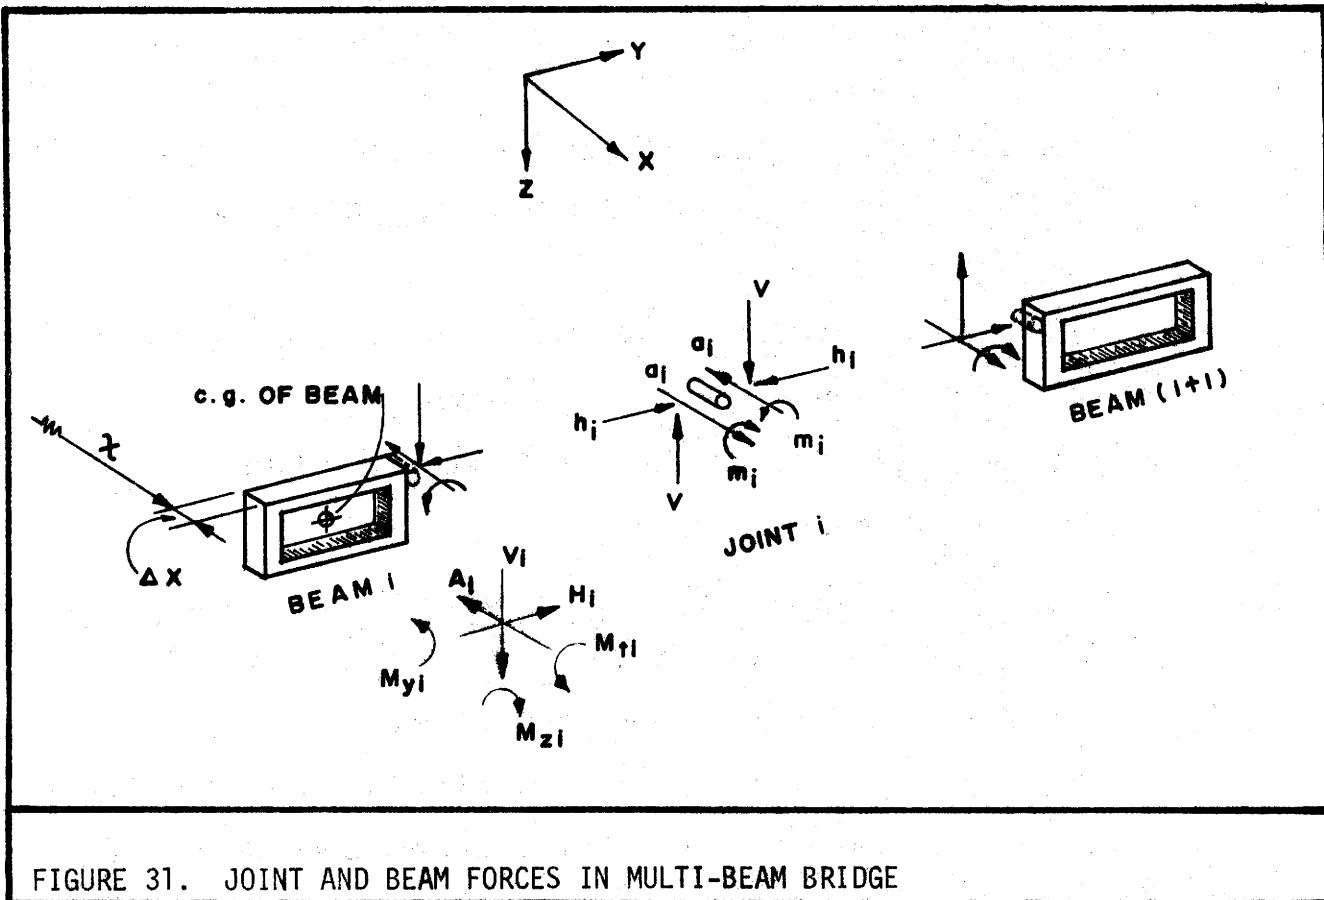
JOINT AND BEAM FORCES IN MULTI-BEAM BRIDGE
